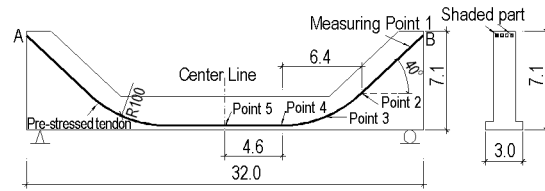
Prestressed tendon layout of beam with T-shaped section (mm)
